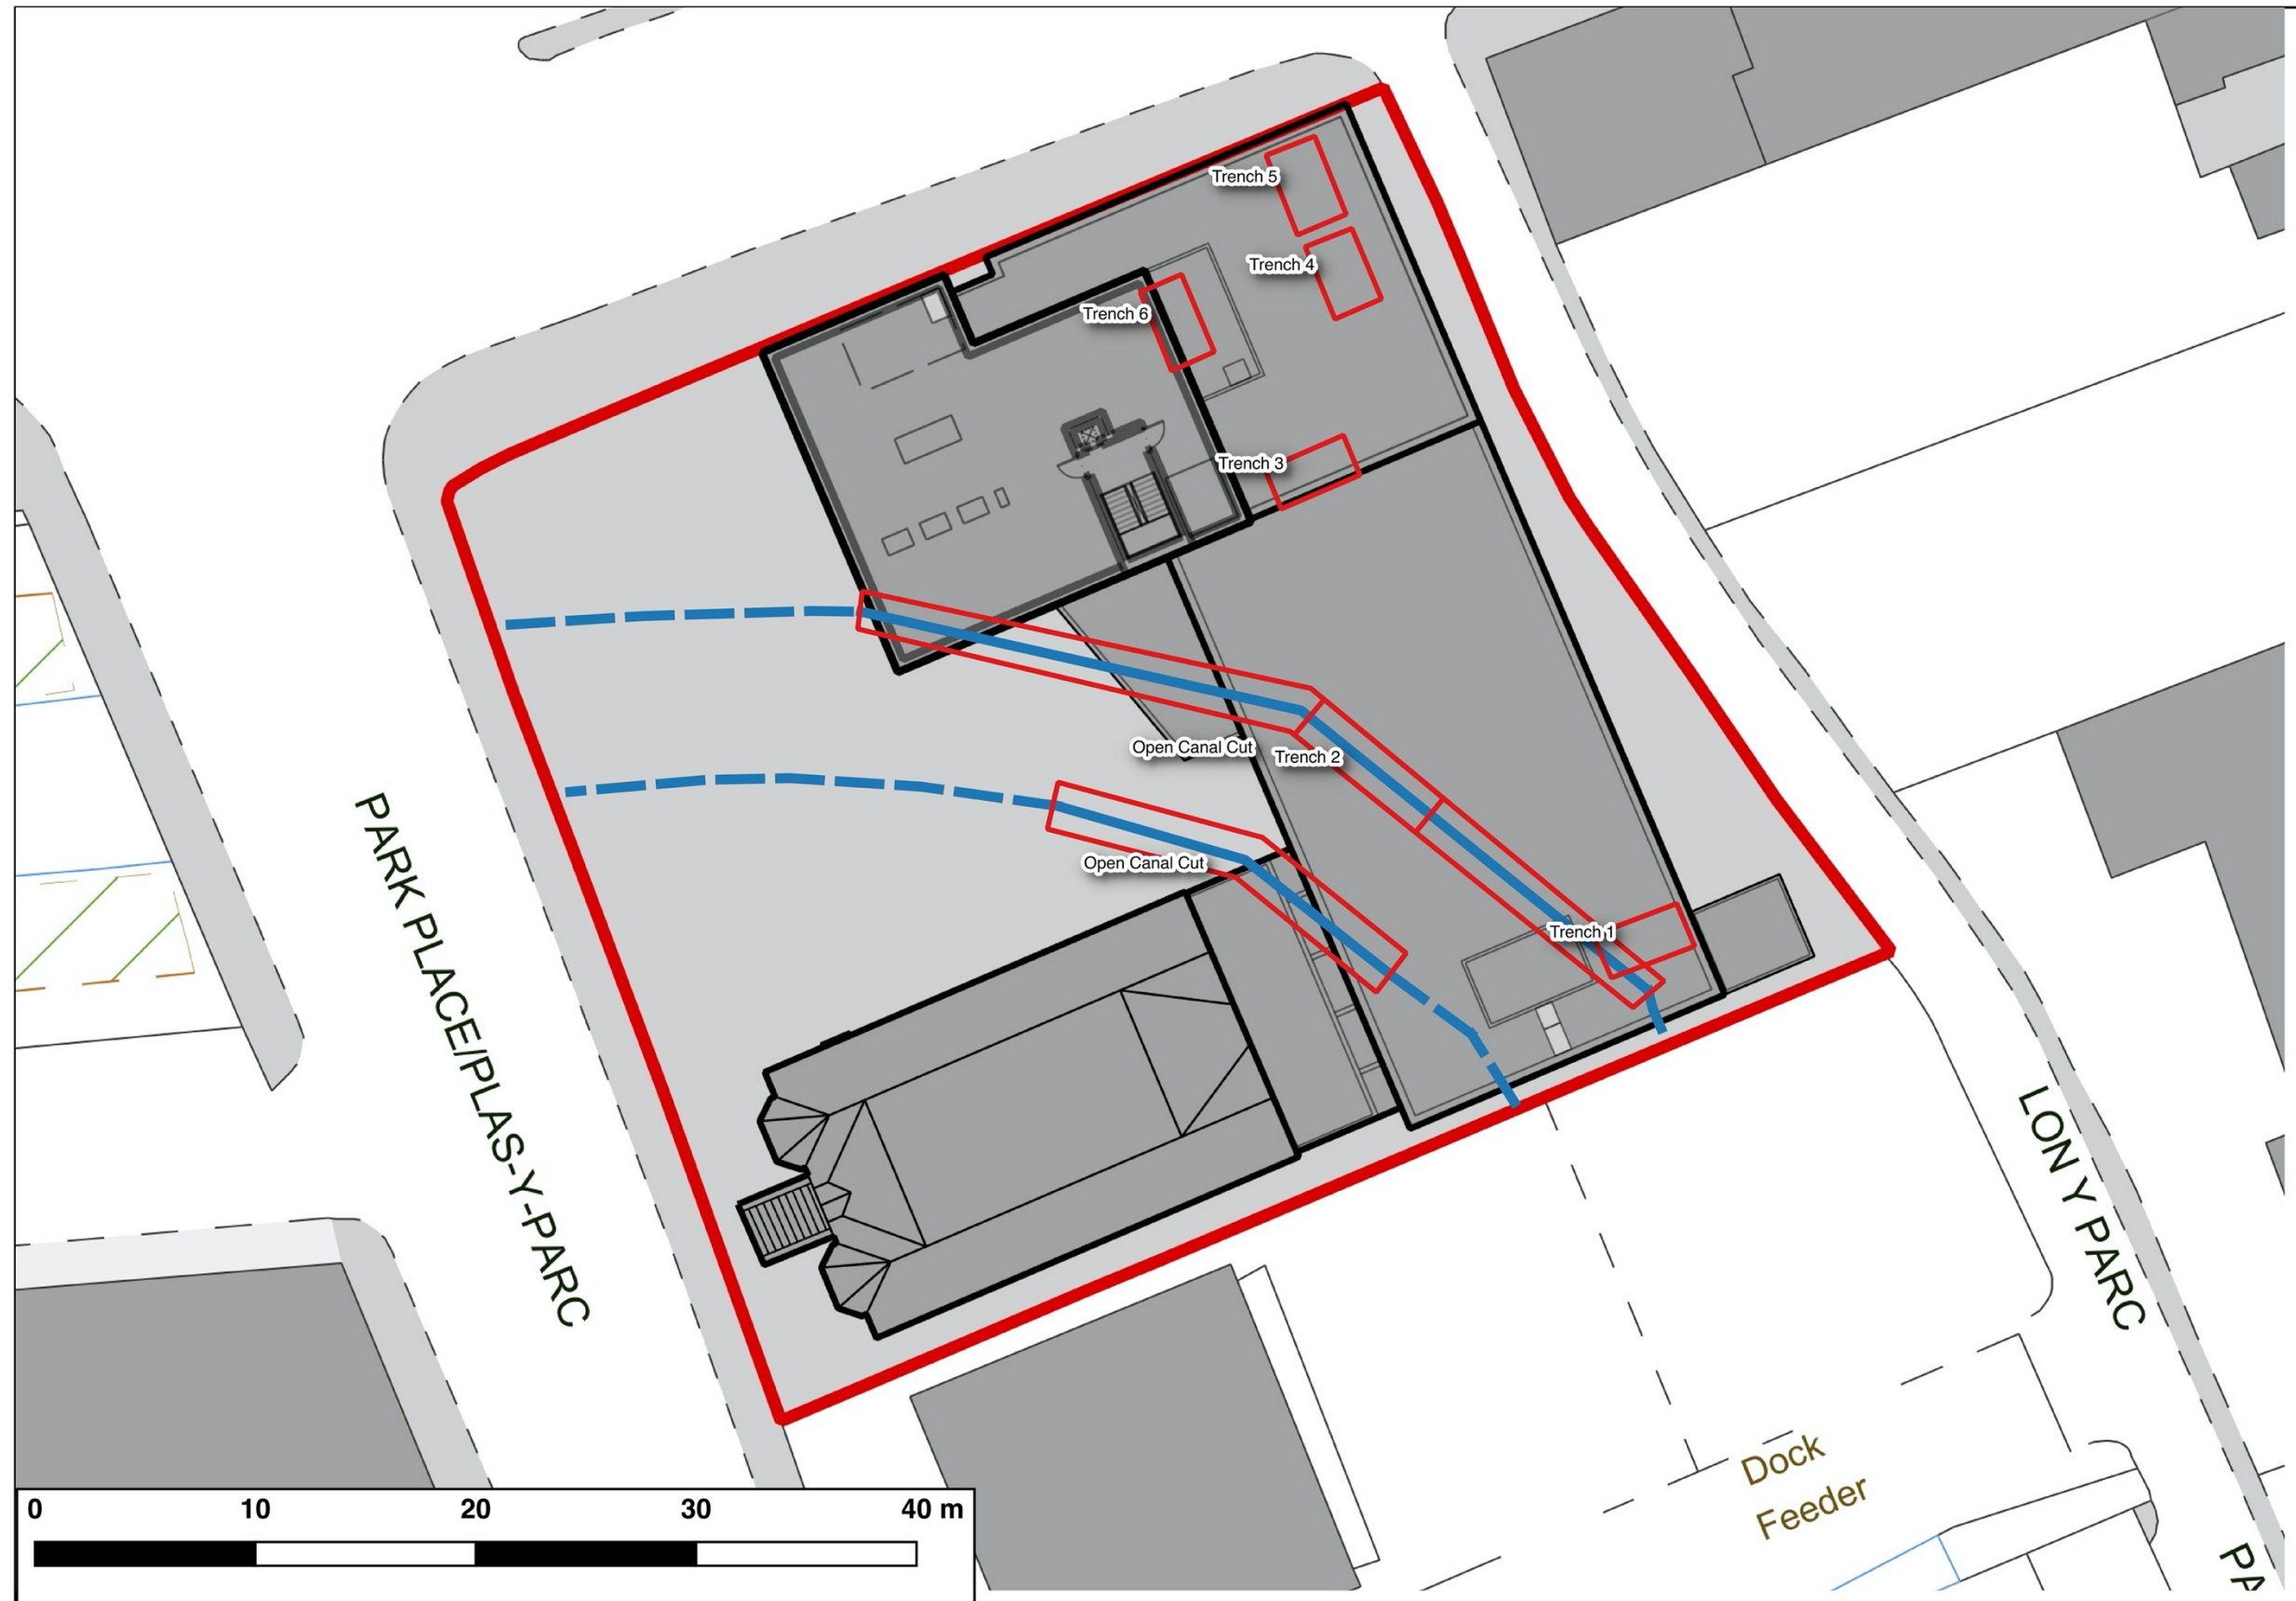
Site plan showing development area (red) and six excavated trenches with the open canal cut.
